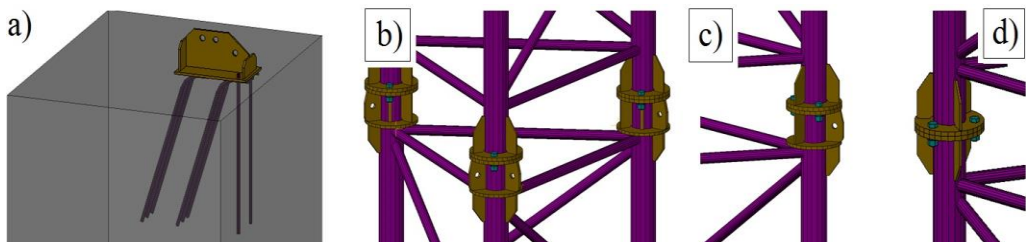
a) guy anchoring system; b) segment-to-segment connection with double guy rope anchoring detail; c) single guy rope anchoring; d) standard segment-to-segment connection
